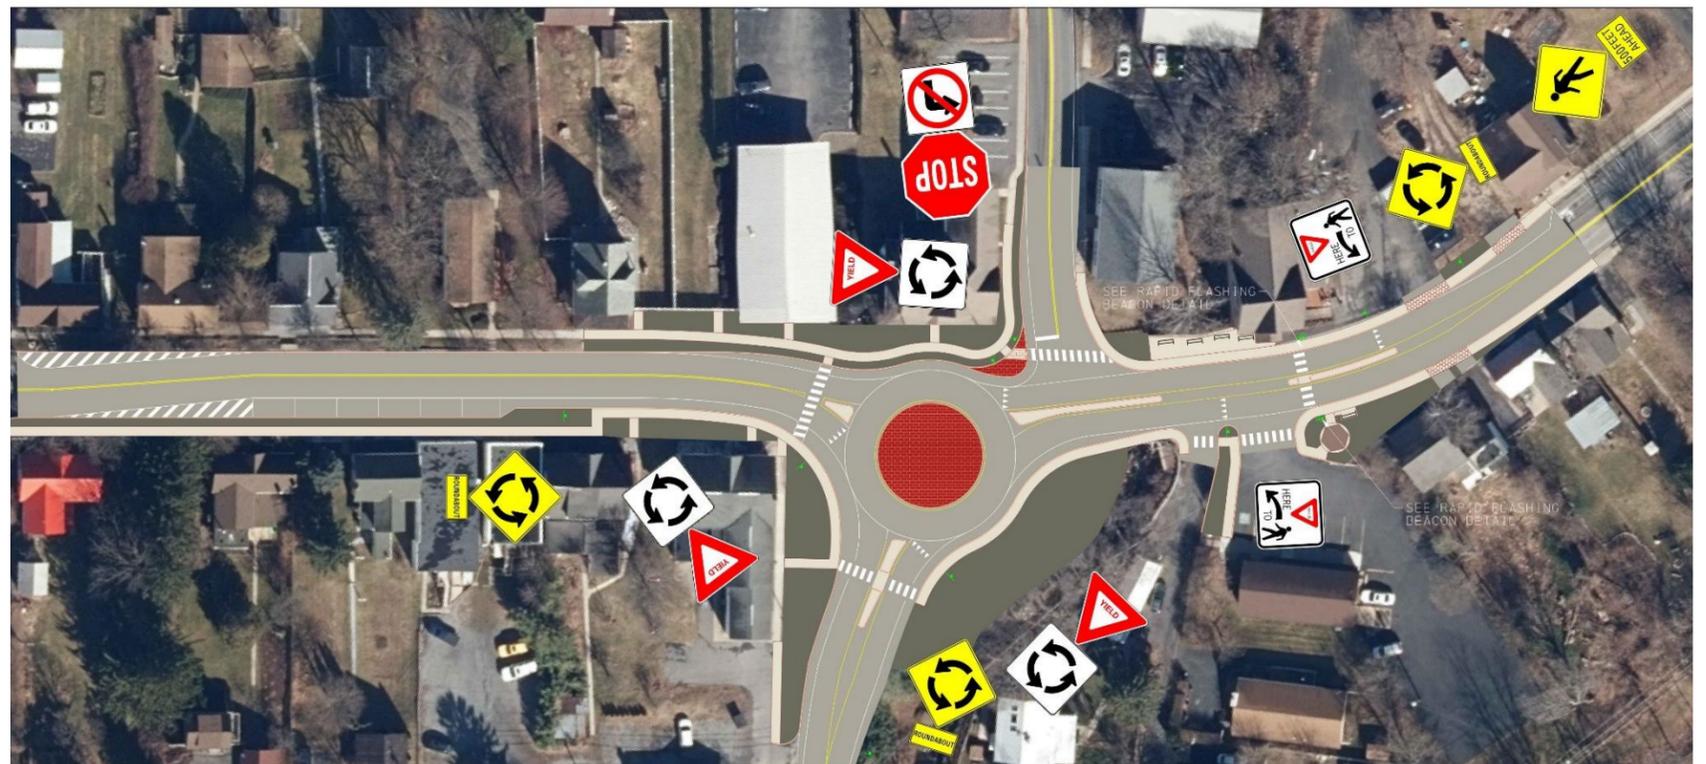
Pine Grove Road & Water Street/Nixon Road – Concept A.3, Large Roundabout Option
